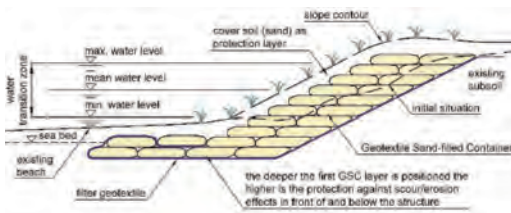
Schematic cross-section dune protection with Geotextile Sand Containers (GSC) underground structure, covering with beach sand and planting with helm grass.
